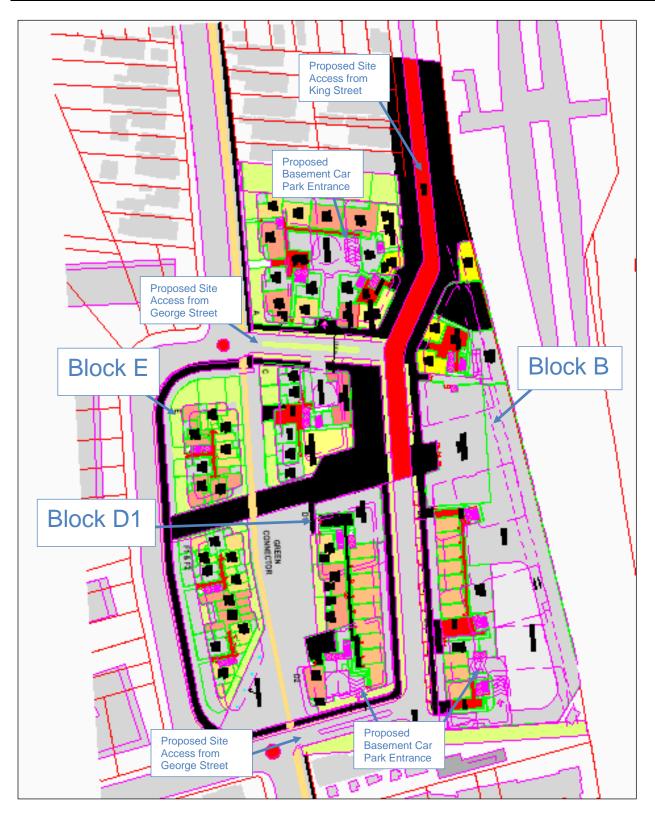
Ground floor architecture plan (Source: GroupGSA, dated March 2024)
